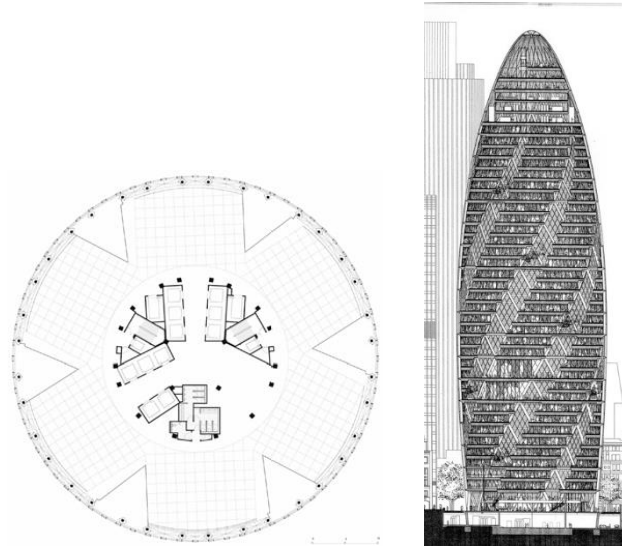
Mid-level floor Plan [1, p. 39] (left) and Illustrative section [6] (right) of Swiss Re tower
